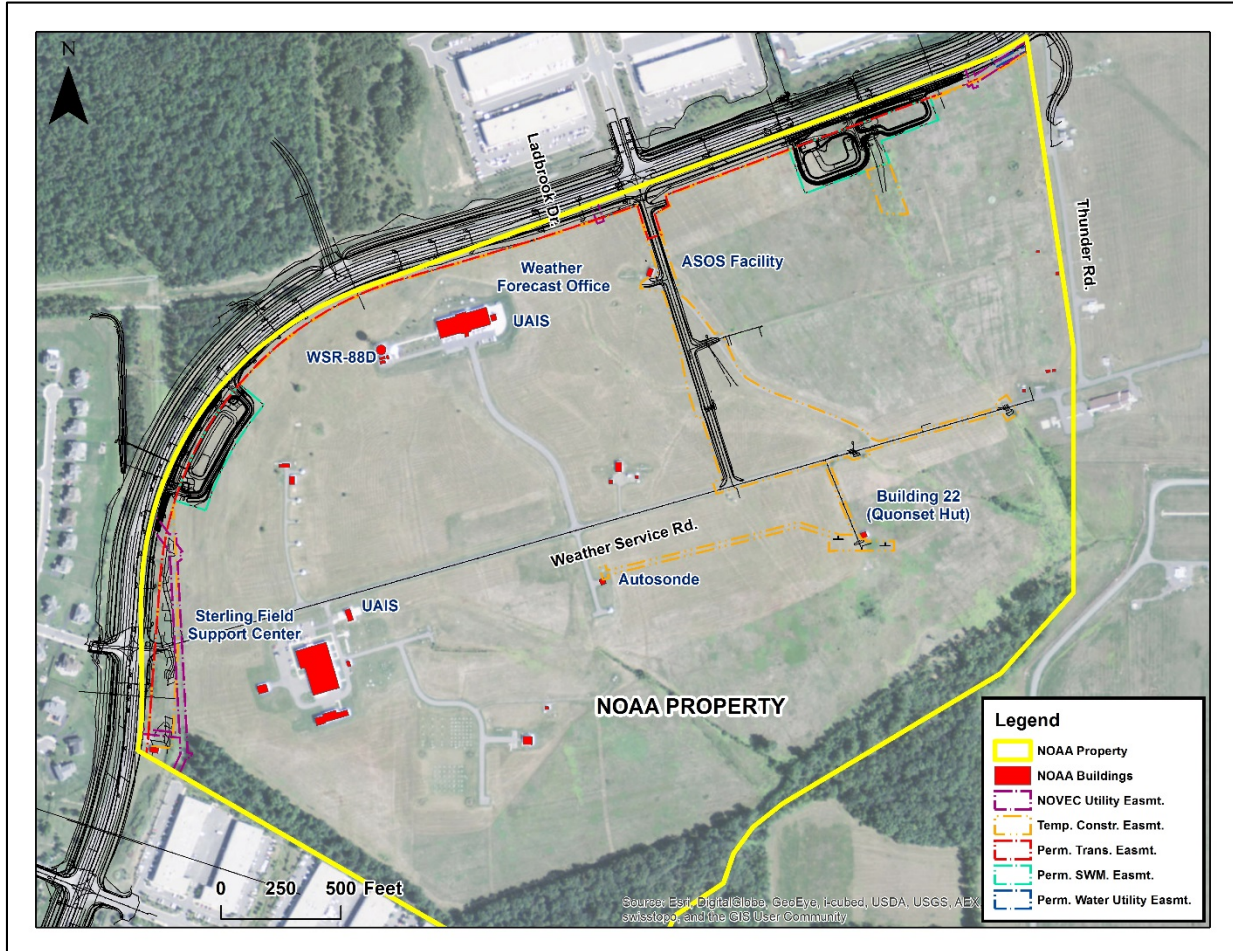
Proposed VDOT Route 606 Reconstruction Project on NOAA Property
